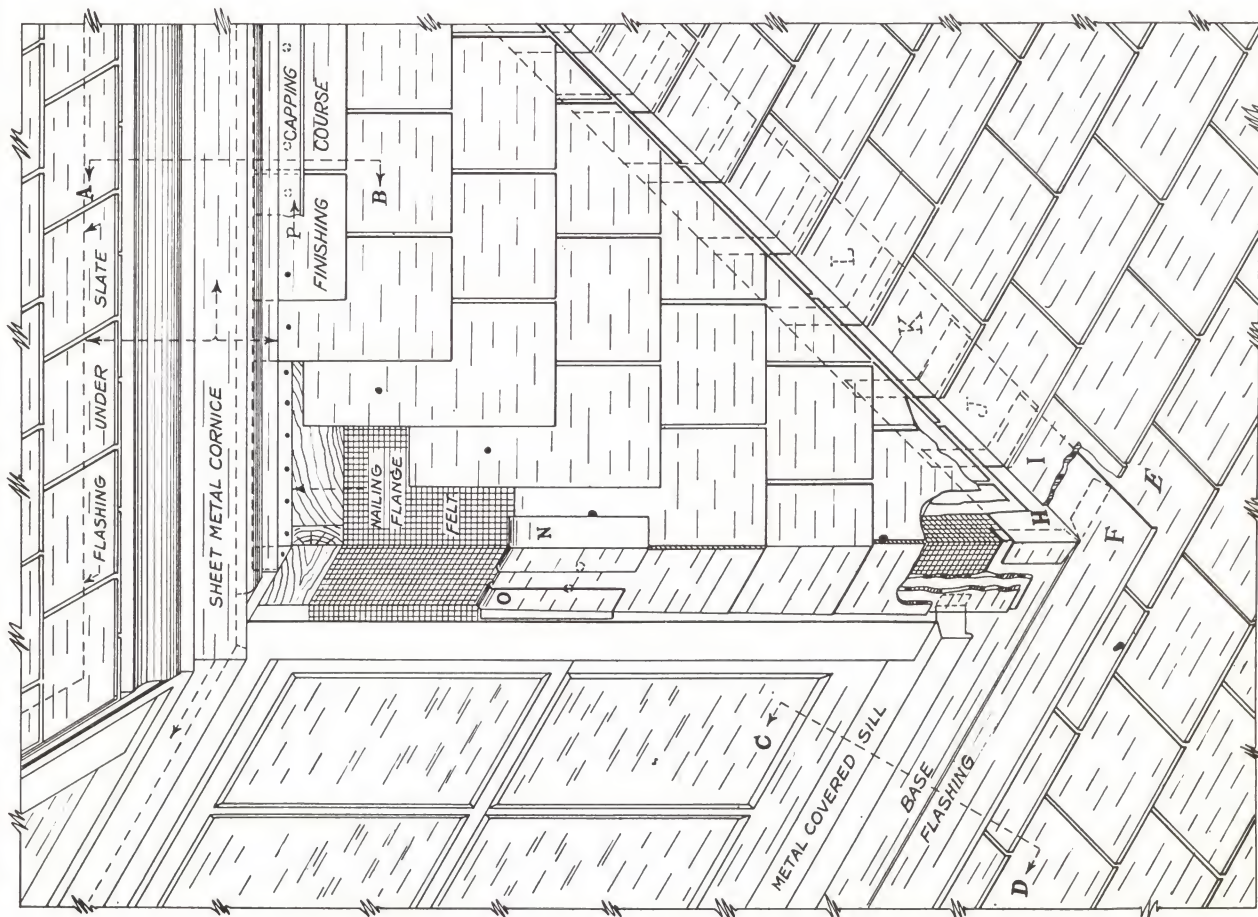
FLASHING DORMER WINDOW WHEN CHEEKS, FRONT AND ROOFS ARE COVERED WITH EITHER SLATE FLAT TILE OR SHINGLE
